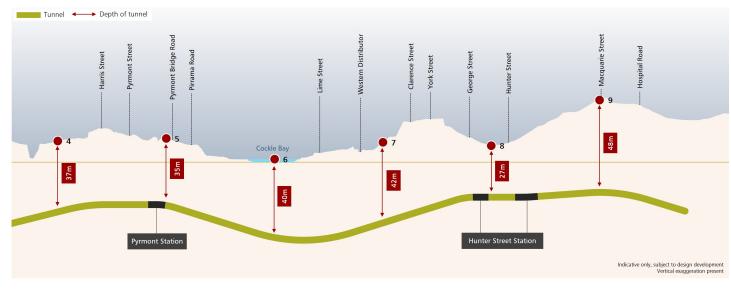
Indicative tunnel alignment plan and topography (eastern section)
